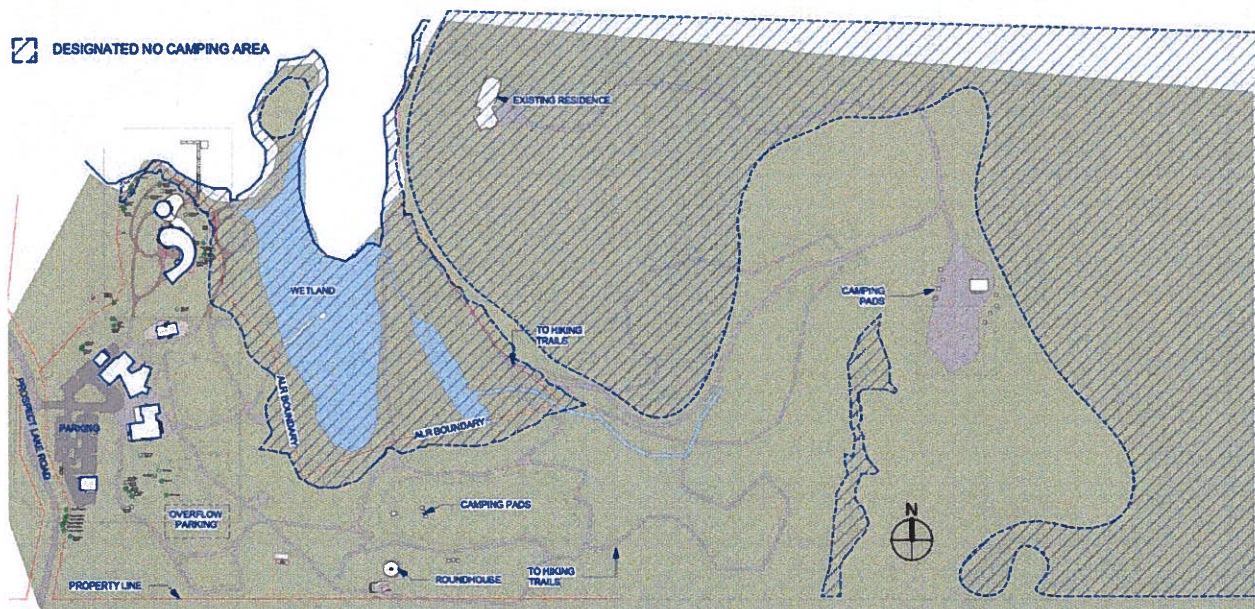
Site Plan (from plans by Christine Lintott Architects Inc.)
